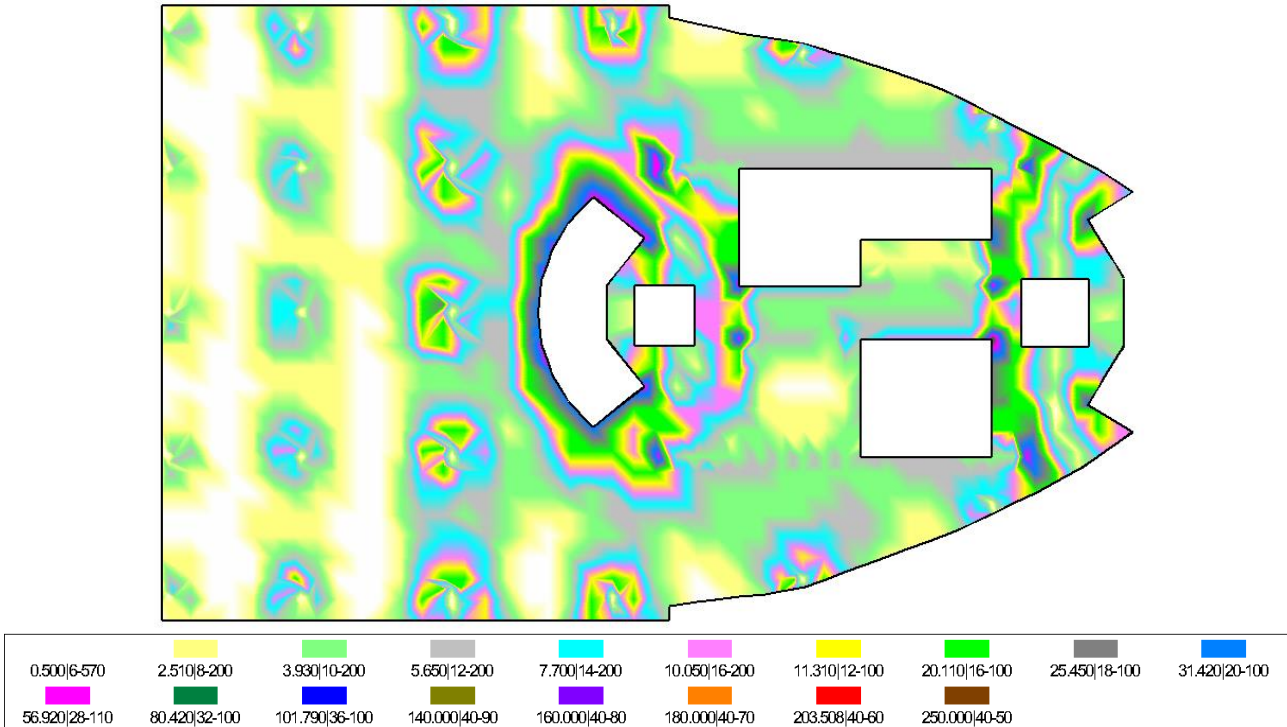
Reinforcement of the floor slab of the western tower at +42.80 m. Upper longitudinal reinforcement in the direction of the axis R, cm²/m [15]
